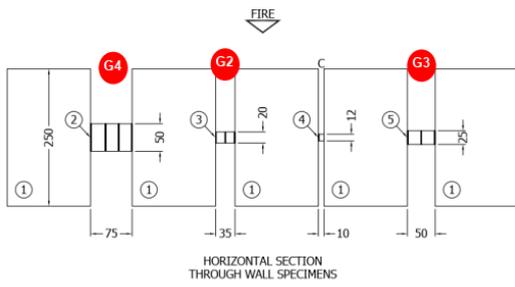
Cross-section of wall linear gap systems G2-G4 – assessment 1 (as shown in WF 160399) – dimensions in mm
